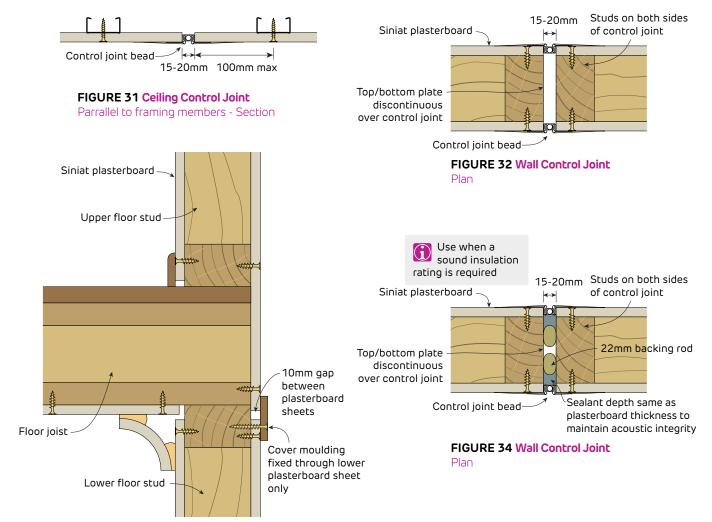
Horizontal Control Joint at Mid-floor Section
